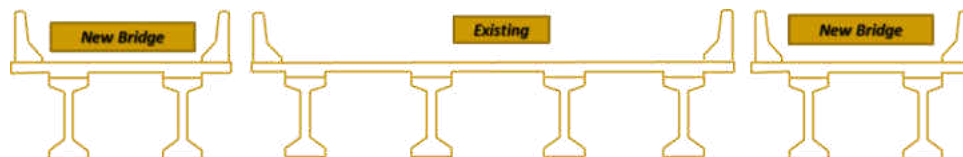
Option V – Inside & Outside Widening (New Bridge Expansion)
